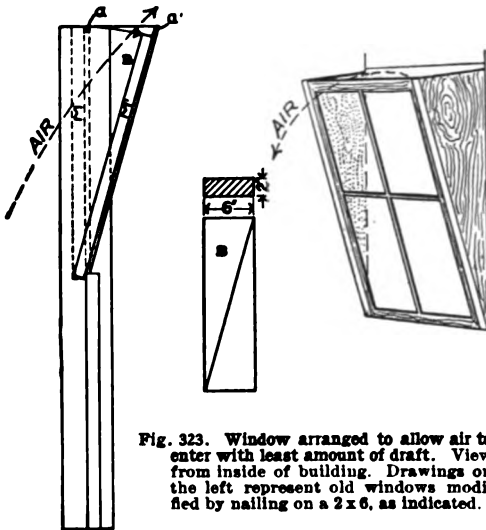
Window arranged to allow air to enter with least amount of draft. View from inside of building. Drawings on the left represent old windows modified by nailing on a 2 x 6, as indicated.
